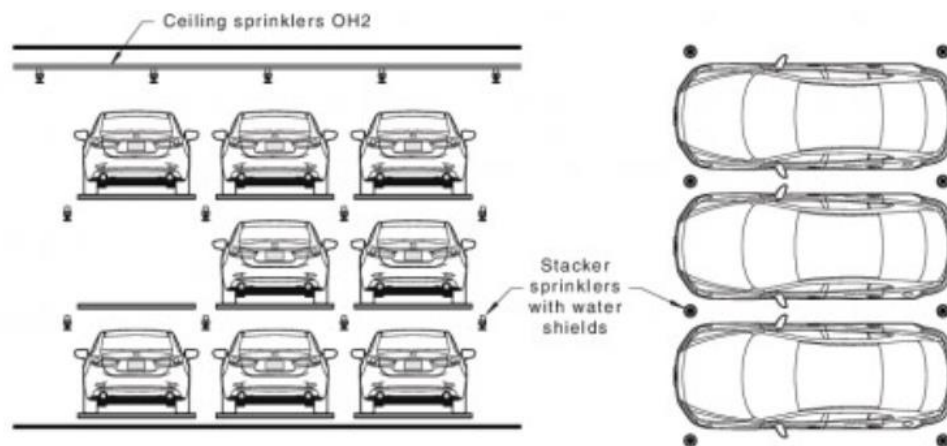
Typical arrangement of open frame AVPS sprinklers (AS 2118.1:2017, 2017).
